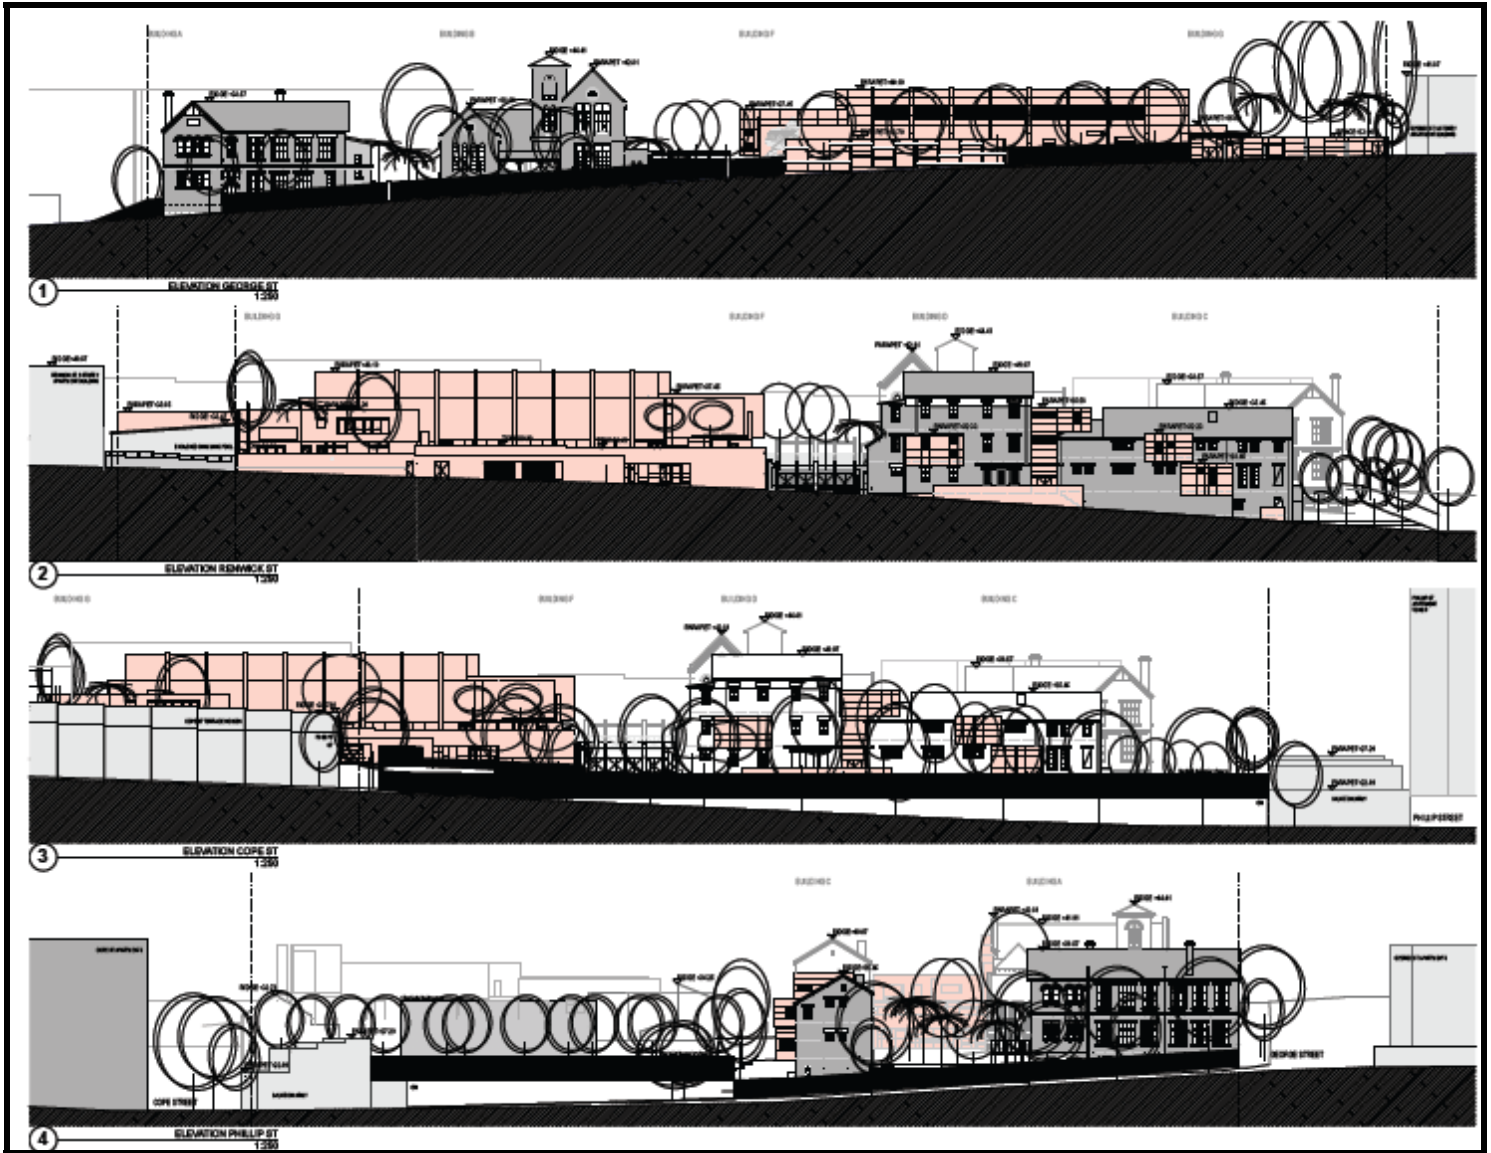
Elevations of existing buildings being retained on the site and the proposed new buildings highlighted in orange.
